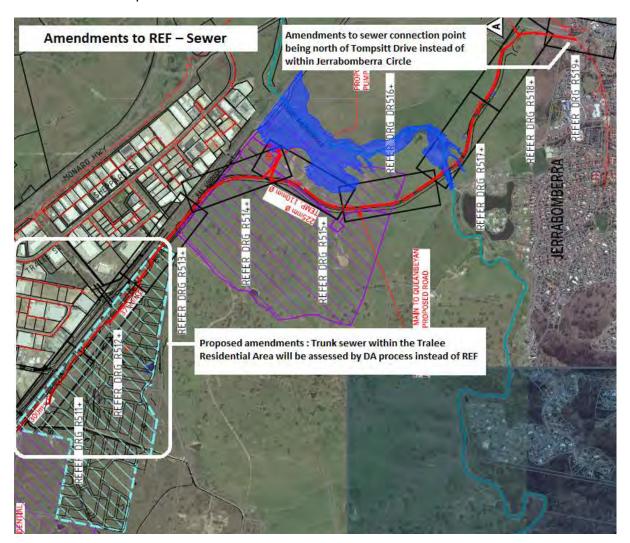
Amendments to sewer infrastructure – Existing proposal shows sewer in red.
